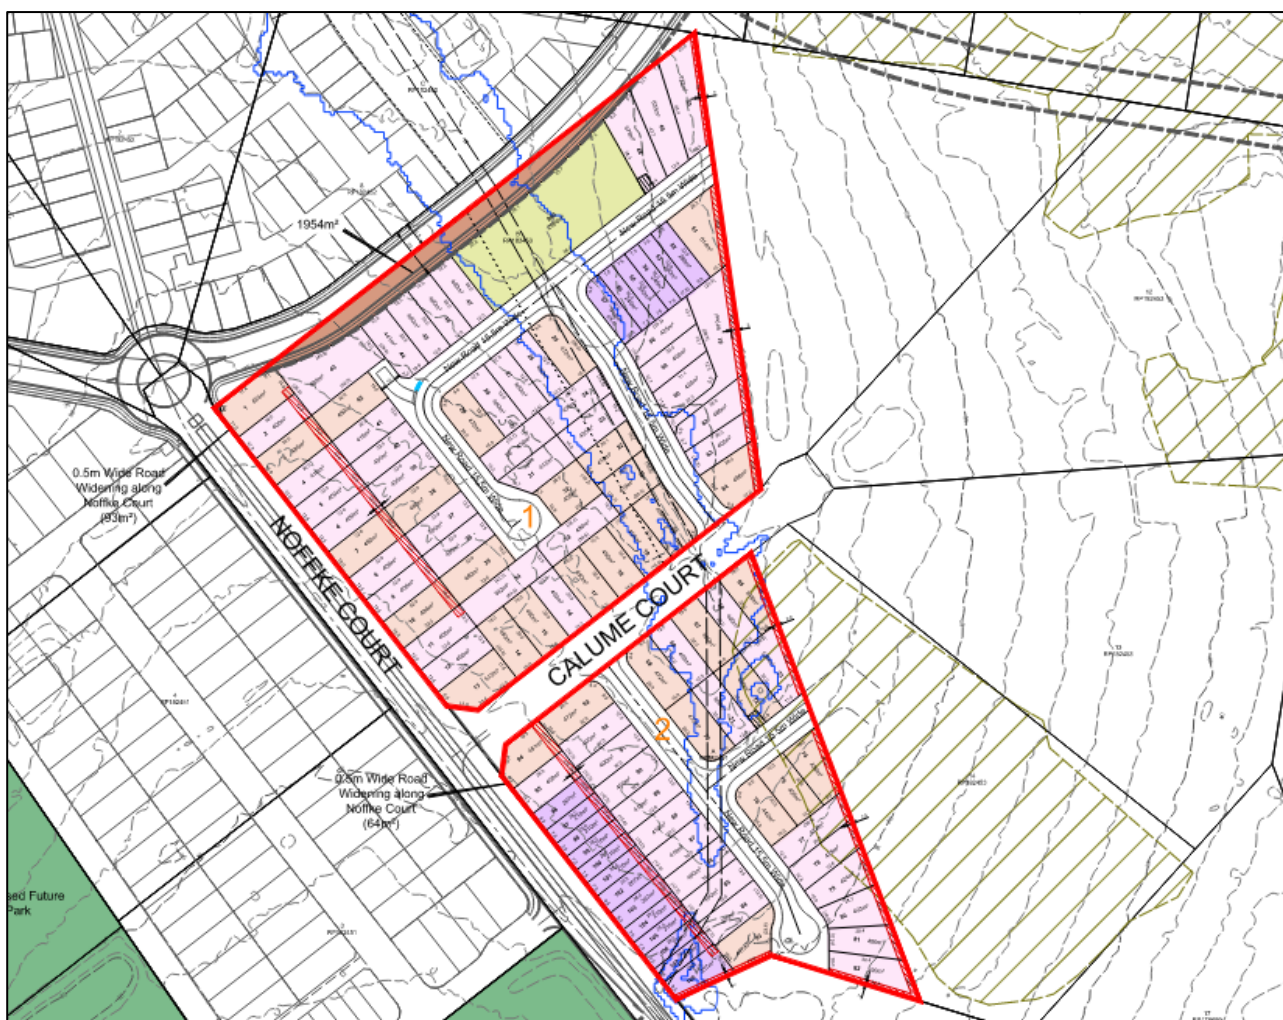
Proposed Masterplan (Saunders Havill, 2025)
